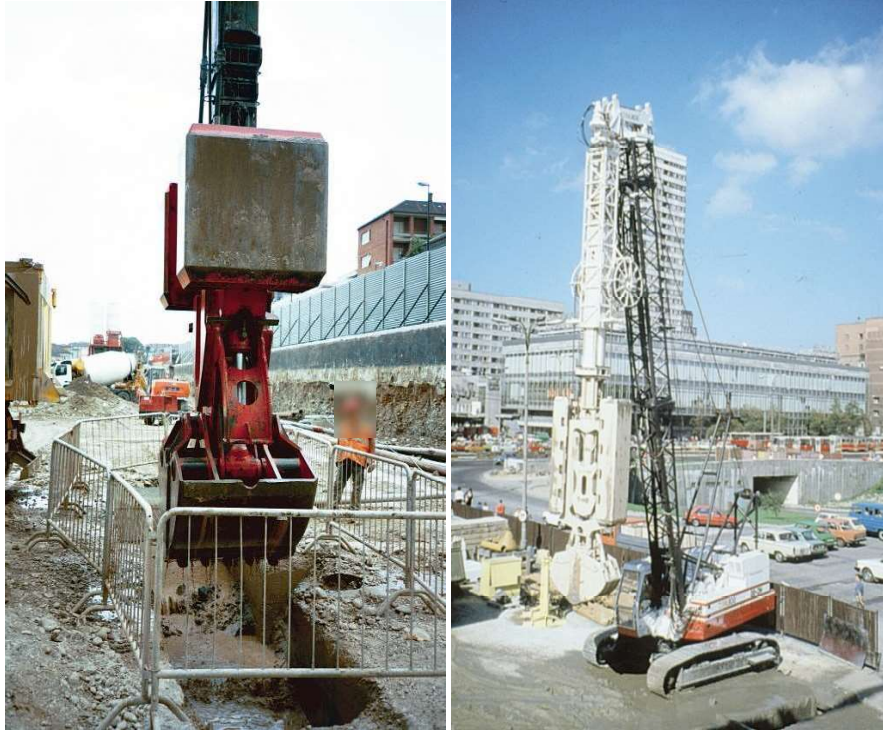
Excavation of a Diaphragm Wall or Barrette Using a Clam
